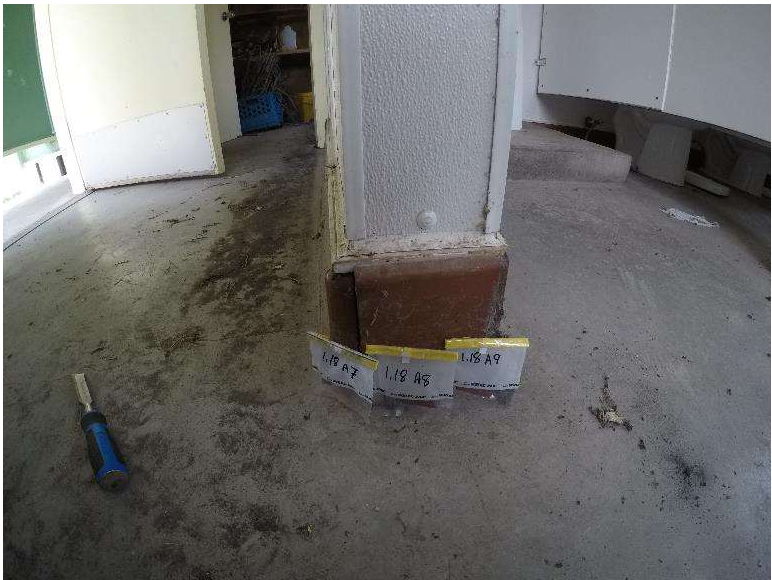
Site 1.18 Crandell Campground Washroom 3.
